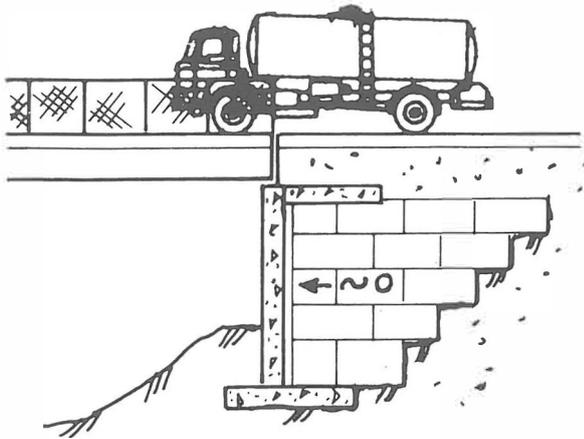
Horizontal forces against the bridge abutment may be dramatically reduced.
